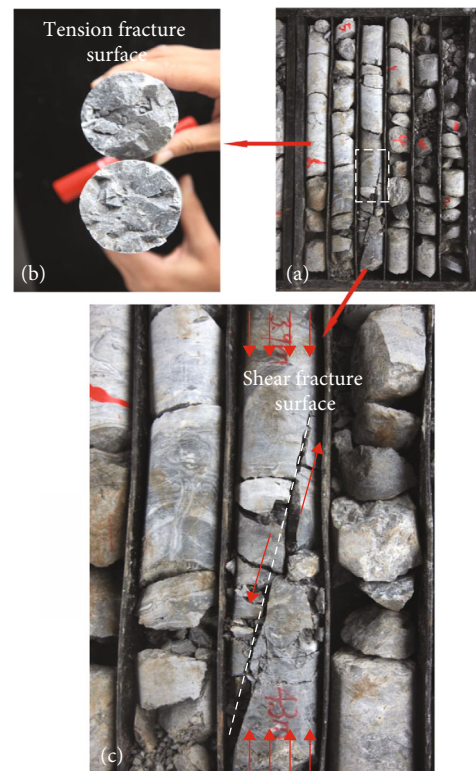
Fragmentation of bedrock. (a) Borehole cores, (b) tension crack surface (rough surface), and (c) shear fracture surface.
